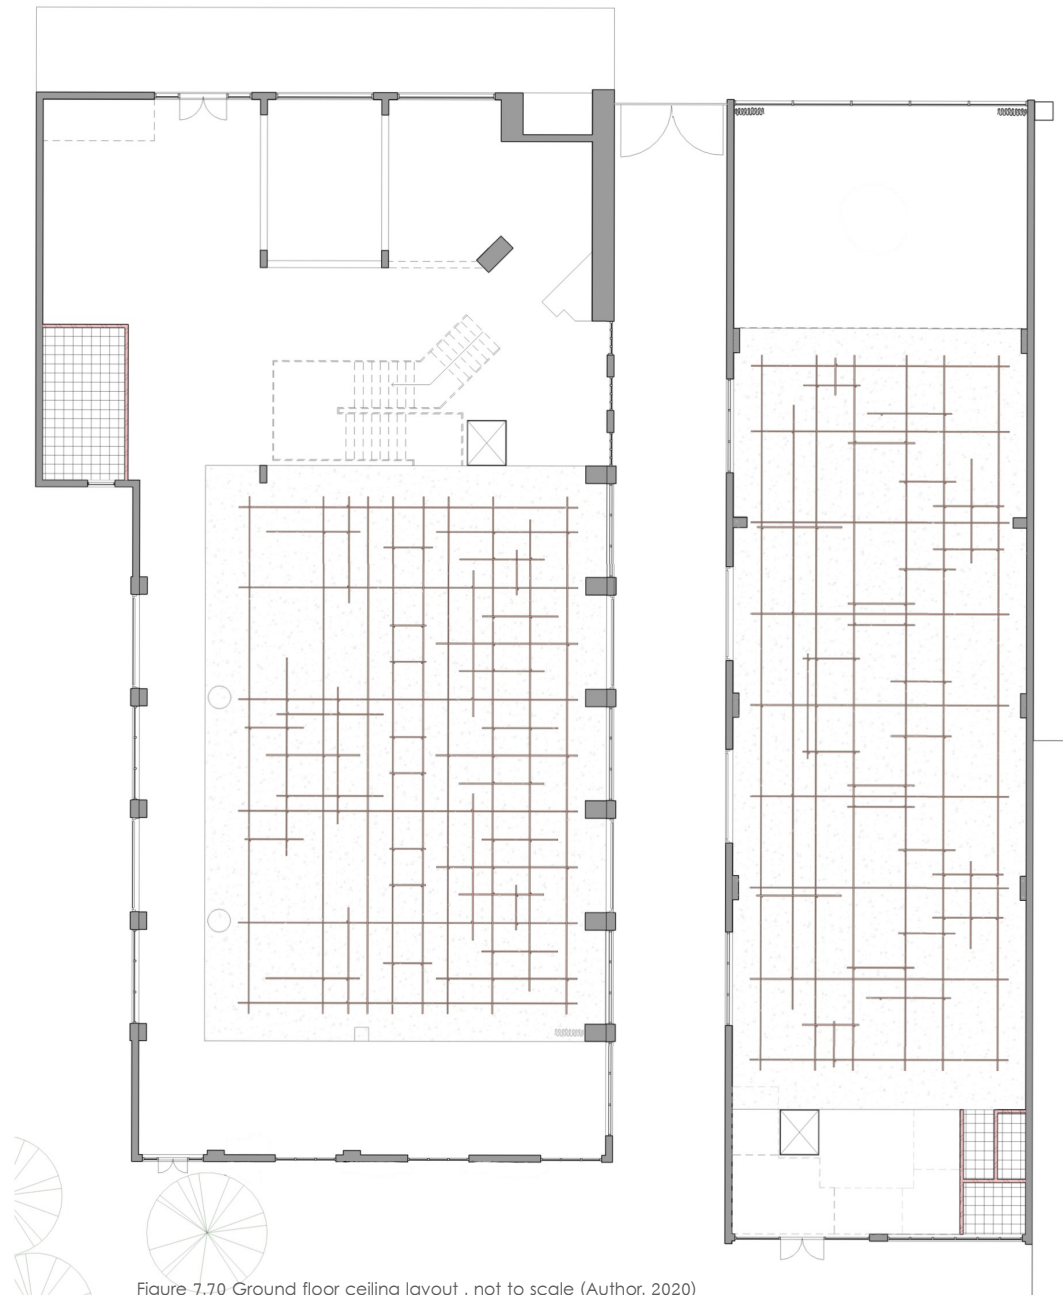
Ground floor ceiling layout , not to scale (Author, 2020)
